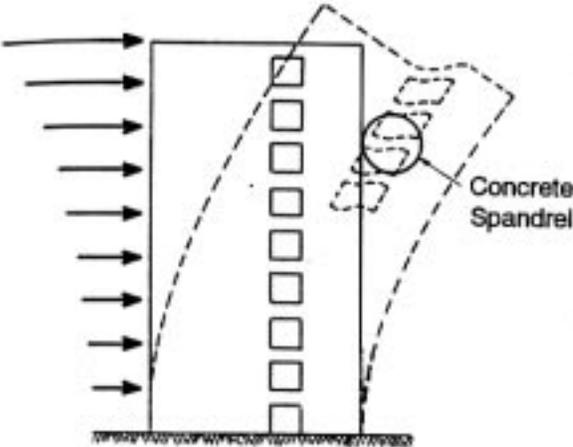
Discontinuity and Source of Damage Created by Vertically Aligned Wall Openings
